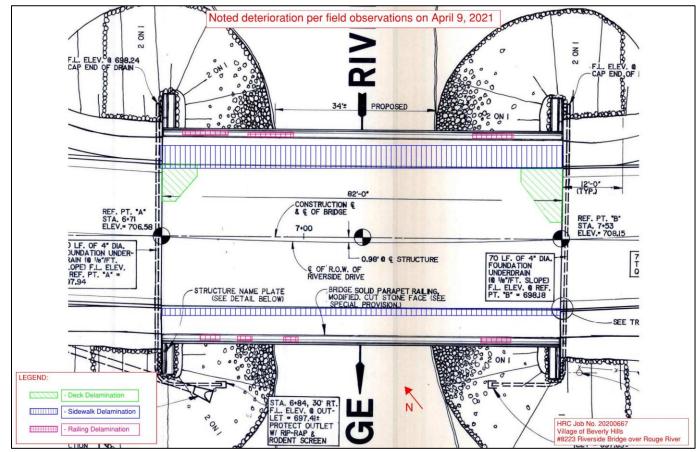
Locations of significant cracking and delamination of the deck, sidewalk and railing.
